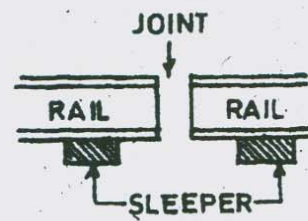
(B) SUSPENDED RAIL JOINT
